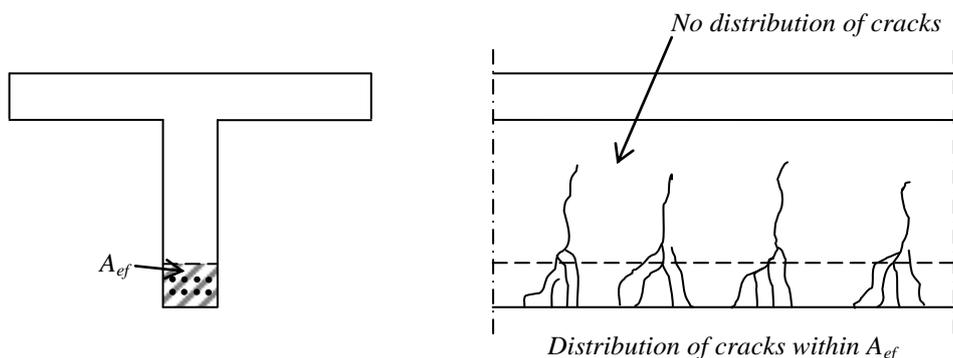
In areas where no reinforcement is located wide cracks can occur even if the total amount of reinforcement fulfils the minimum reinforcement requirement for crack control. The figure is based on Engström (2011d).
